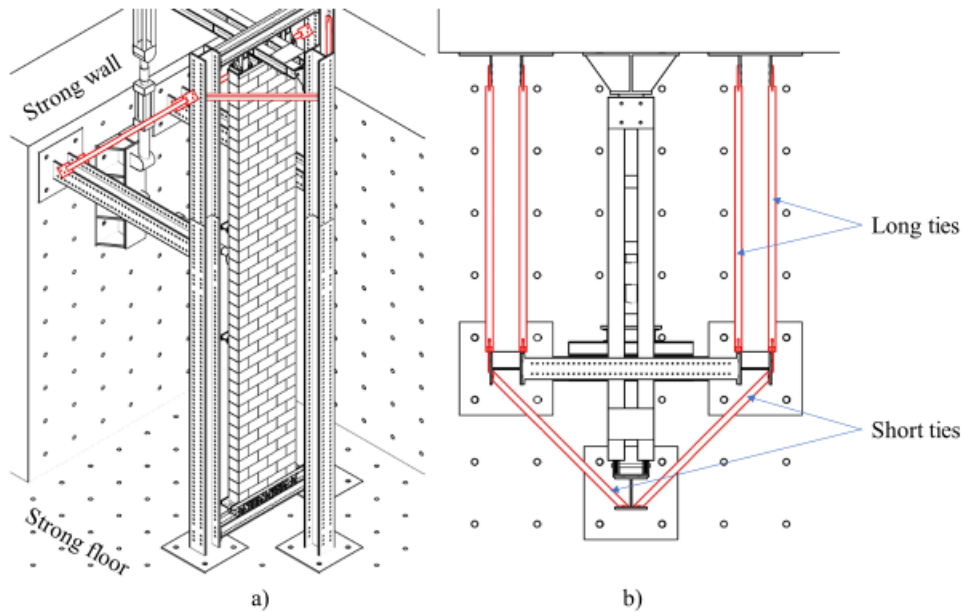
Structural ties for the tall wall loading frame highlighted in red: a) isometric view; and b) plan view
